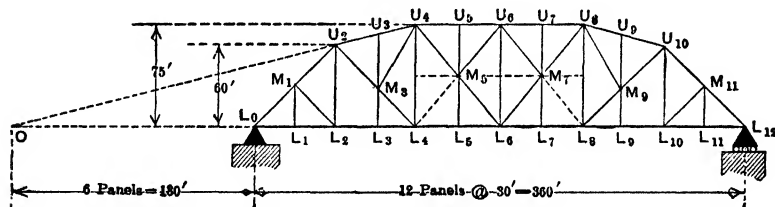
Double-track railroad bridge. Diagonals tension members, except M_1L_2 and $M_{10}L_{11}$. Trusses 33 ft., 0 in. c/c. Tracks 13 ft., 0 in. c/c.
